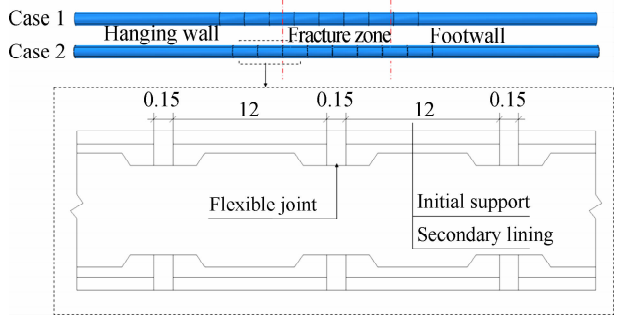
Sketch of tunnel linings with flexible joints (unit: m)
